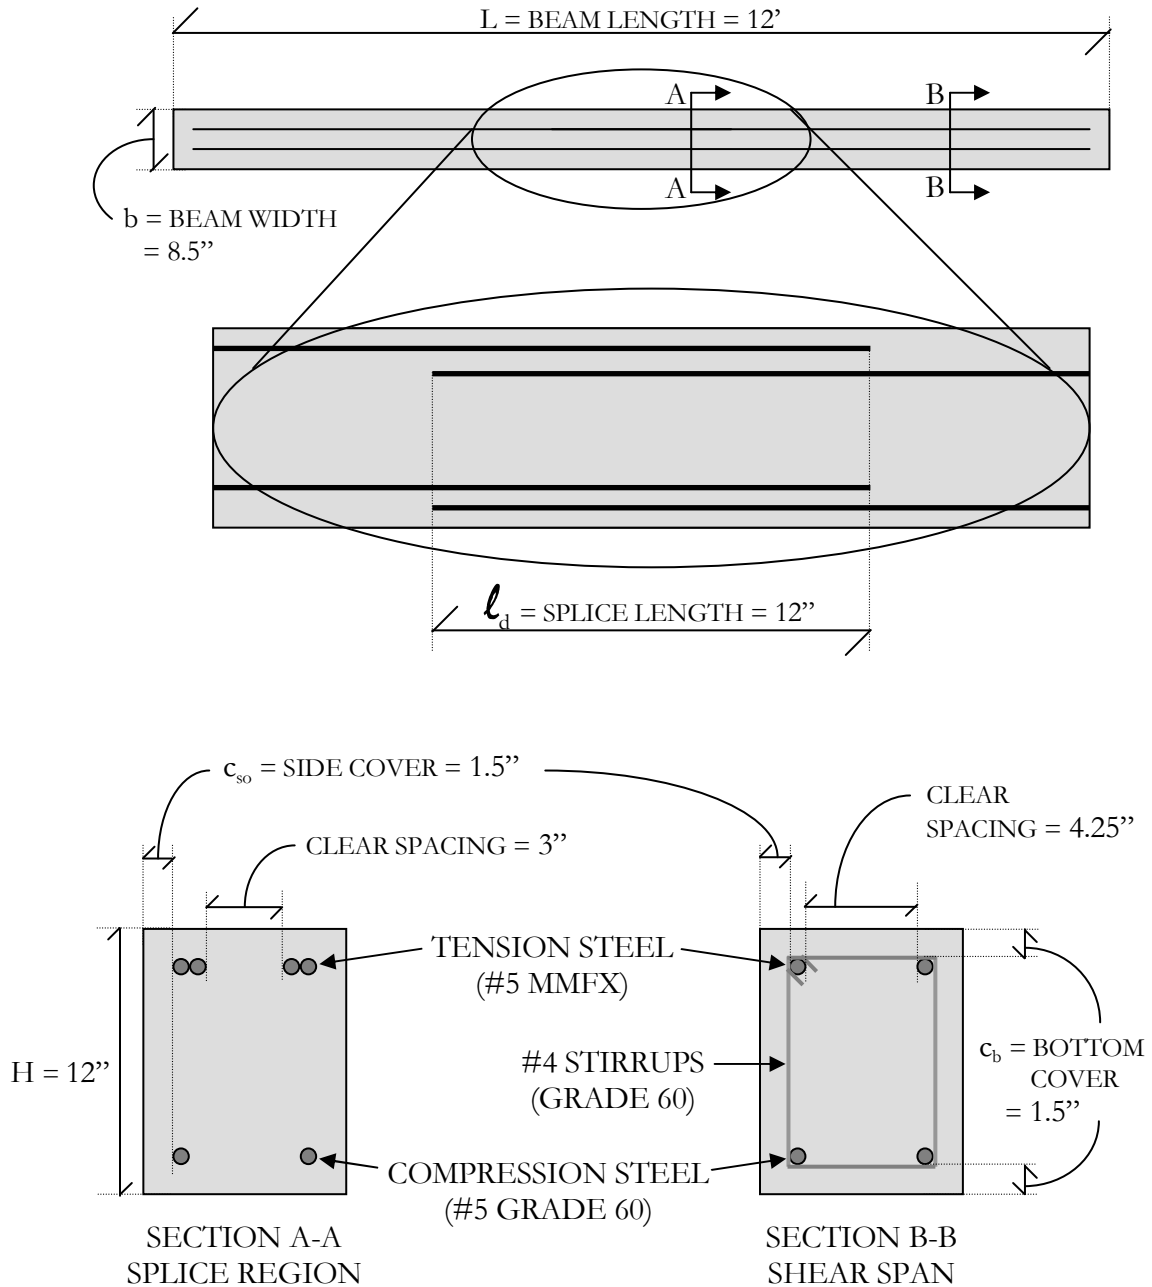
Plan View of Beam, Close-Up of Splice Length, and Section View for Beam C0
